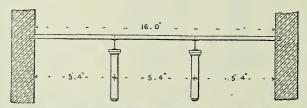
Part Vertical Section of Staircase, showing Iron Columns.
